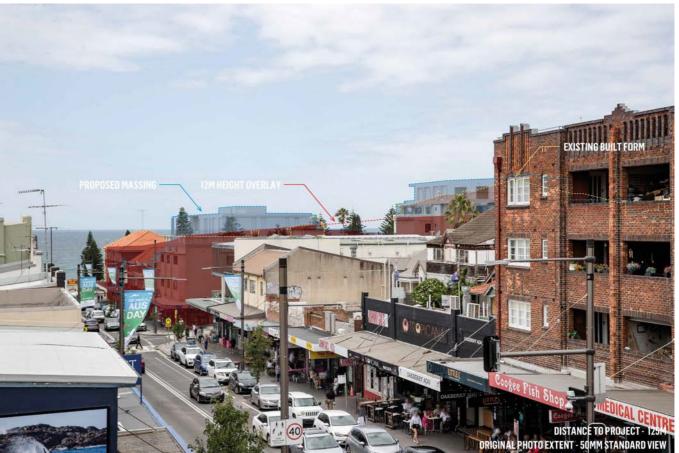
Proposed View including central view corridor which sits below the LEP height control and maintains access to a central section of sea-sky horizon.
